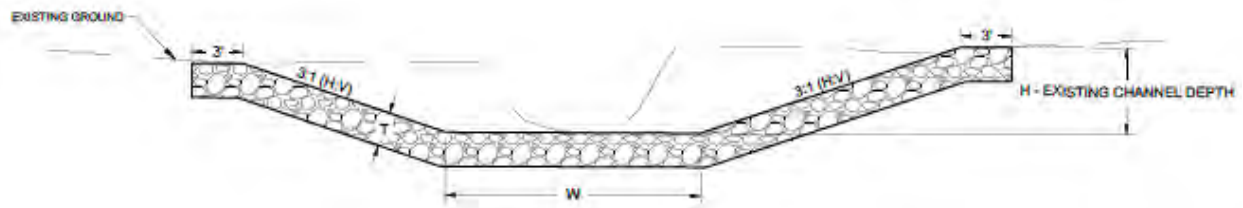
c. Rock Ramp Grade Control – Upstream Sill Cross Section
